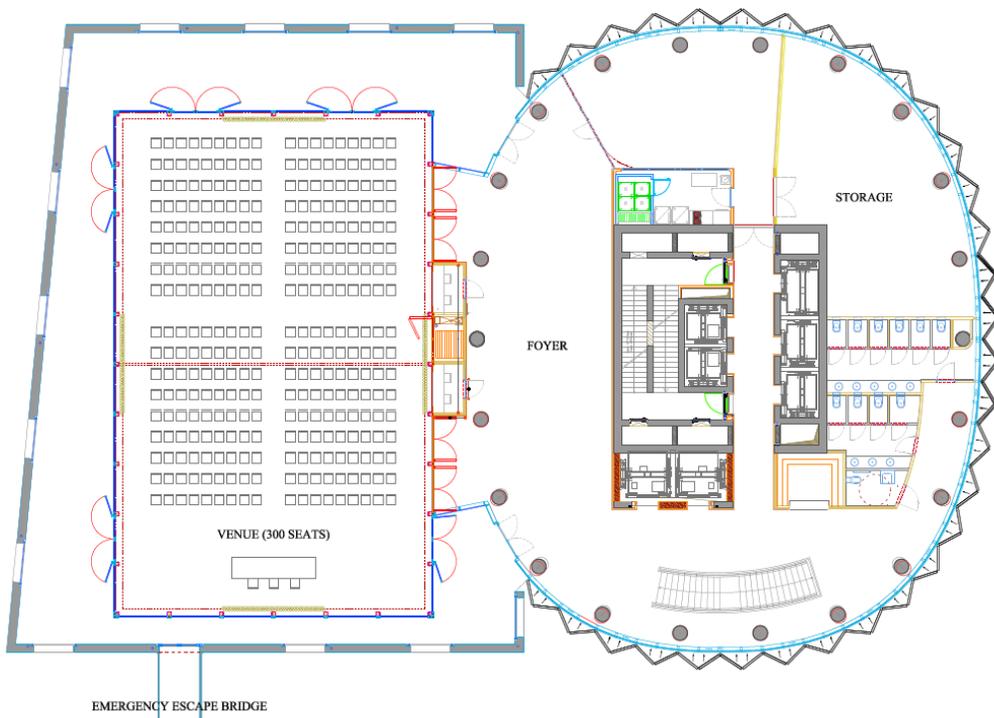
Third Floor Plan Layout (Main Conference Room, Foyer)
